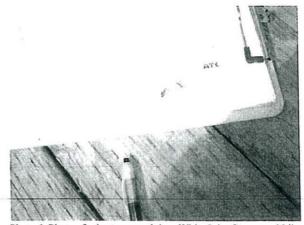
Photo of asbestos containing White Joint Compound Like Material, Sample 22A
